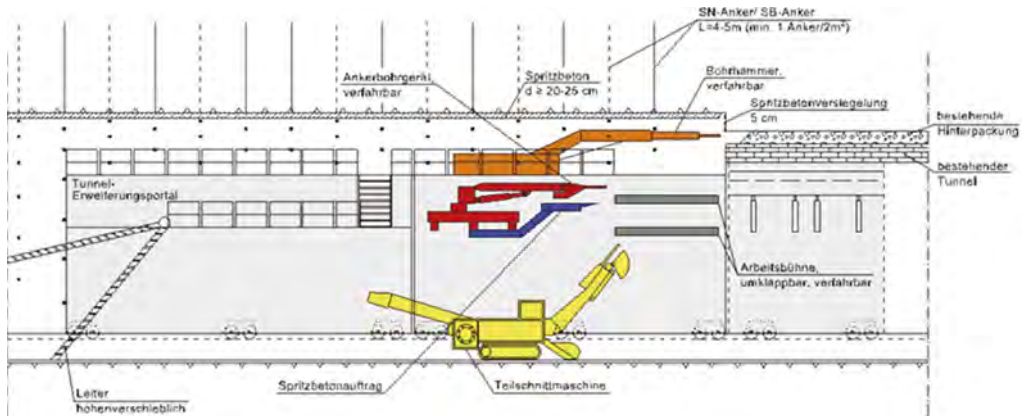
Longitudinal section of the tunnel enlargement system (TES).
